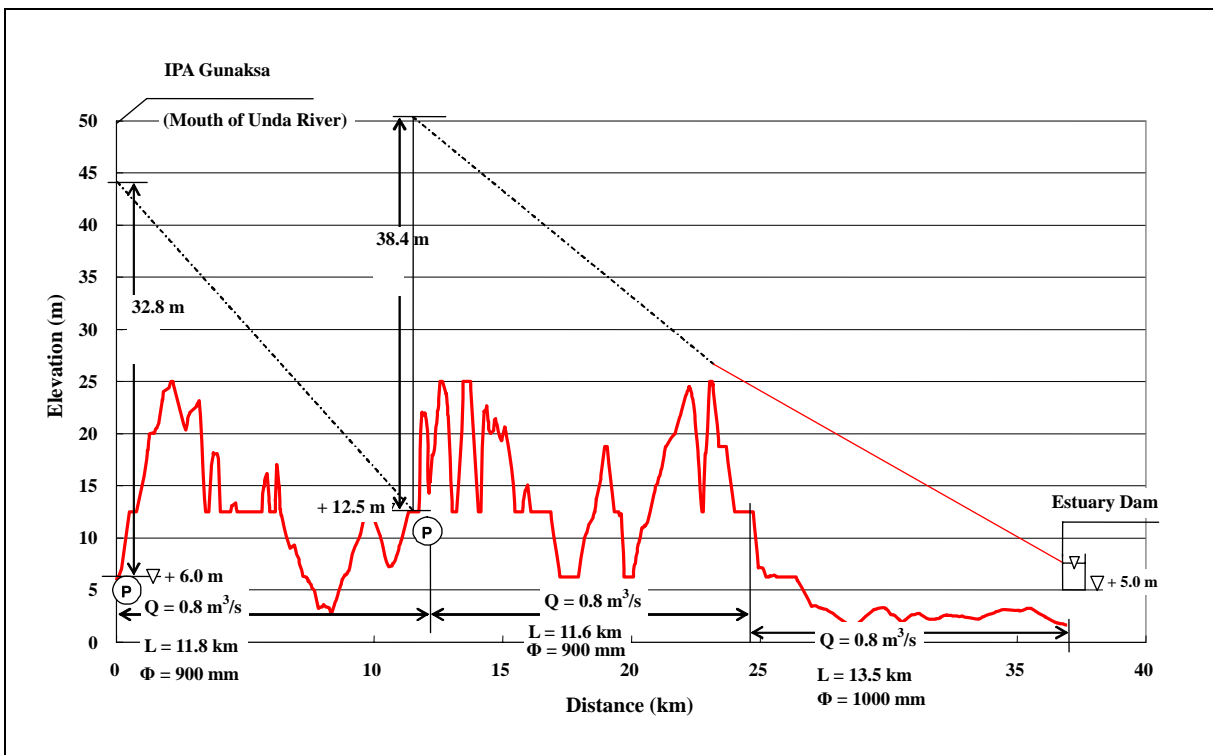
Longitudinal Section and hydraulic Gradient Line of Alternative E3
